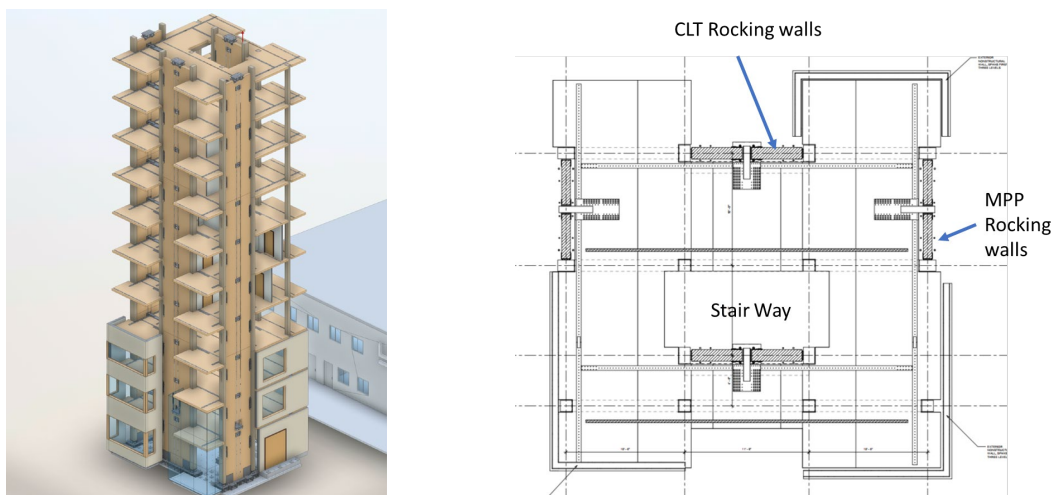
(a) 3D rendering and (b) floor plan of the 10-story test building at the large-scale outdoor shake table facility at UCSD.
